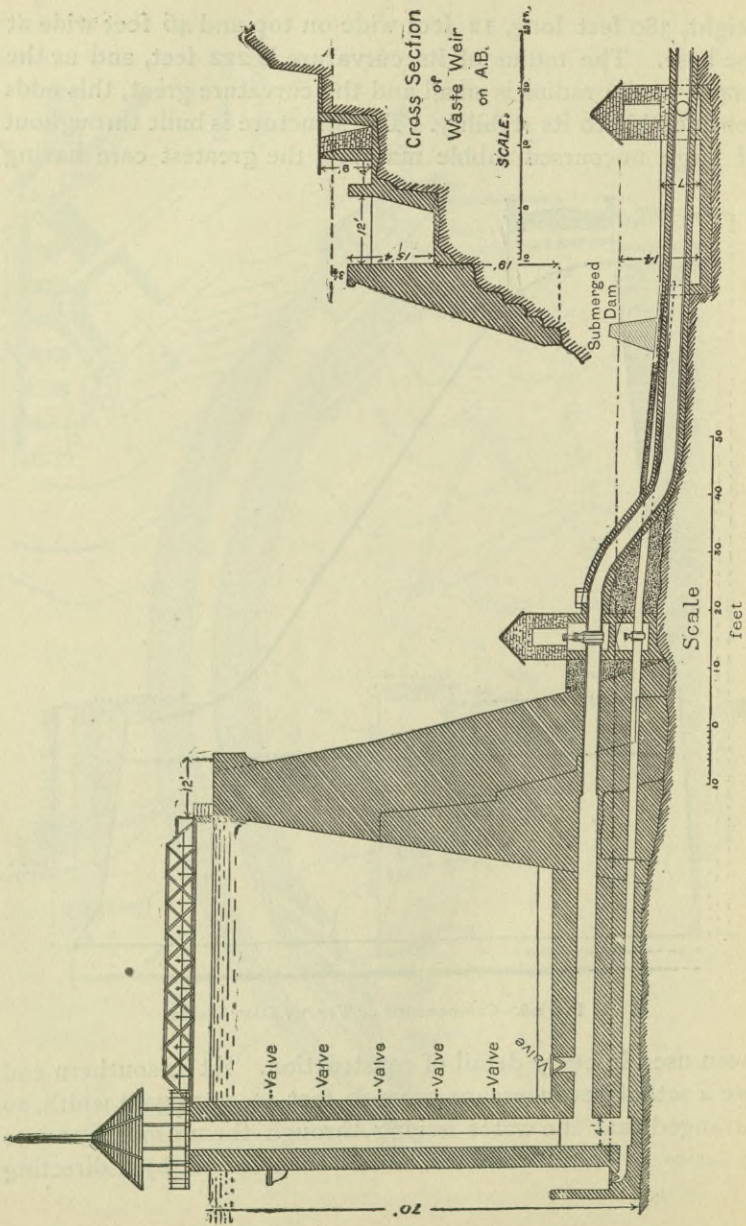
PLATE XXXV.—CROSS-SECTION OF SWEETWATER DAM.
